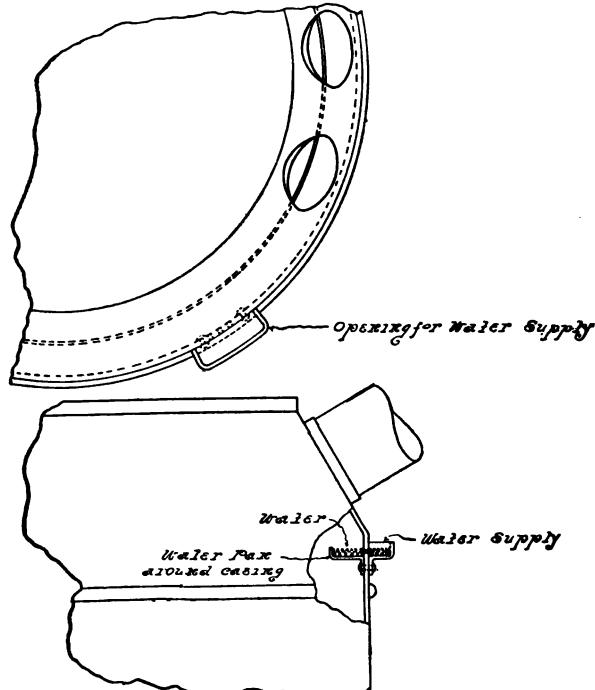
Sectional Elevation and Plans Showing Proper Location of Water Pan.
